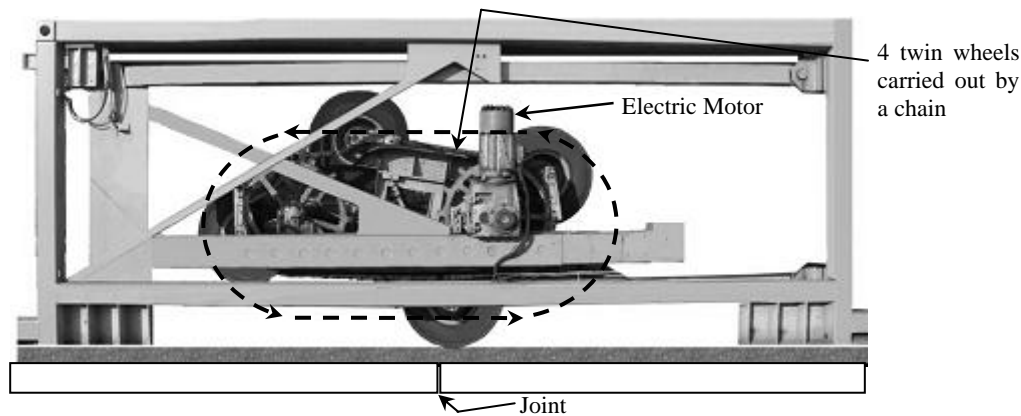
APT equipment used for reflective cracking test on full scale pavement structures at the LCPC.
